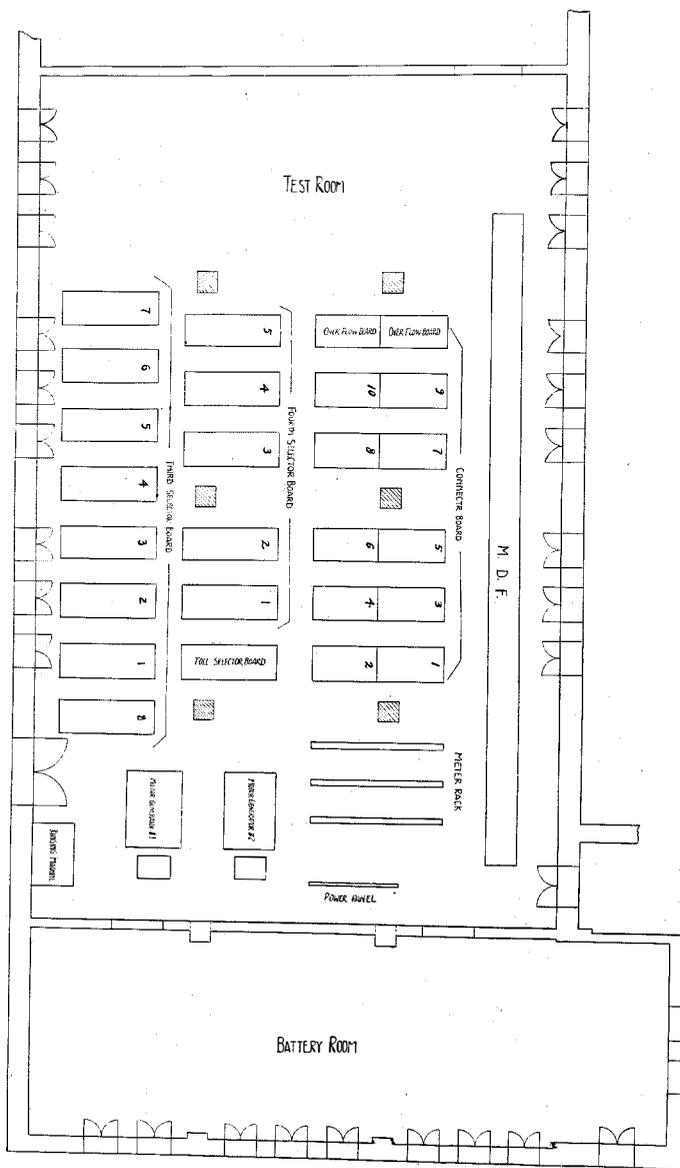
Floor Plan for Switch Room, Ground Floor, Otsuka Office, Tokyo
